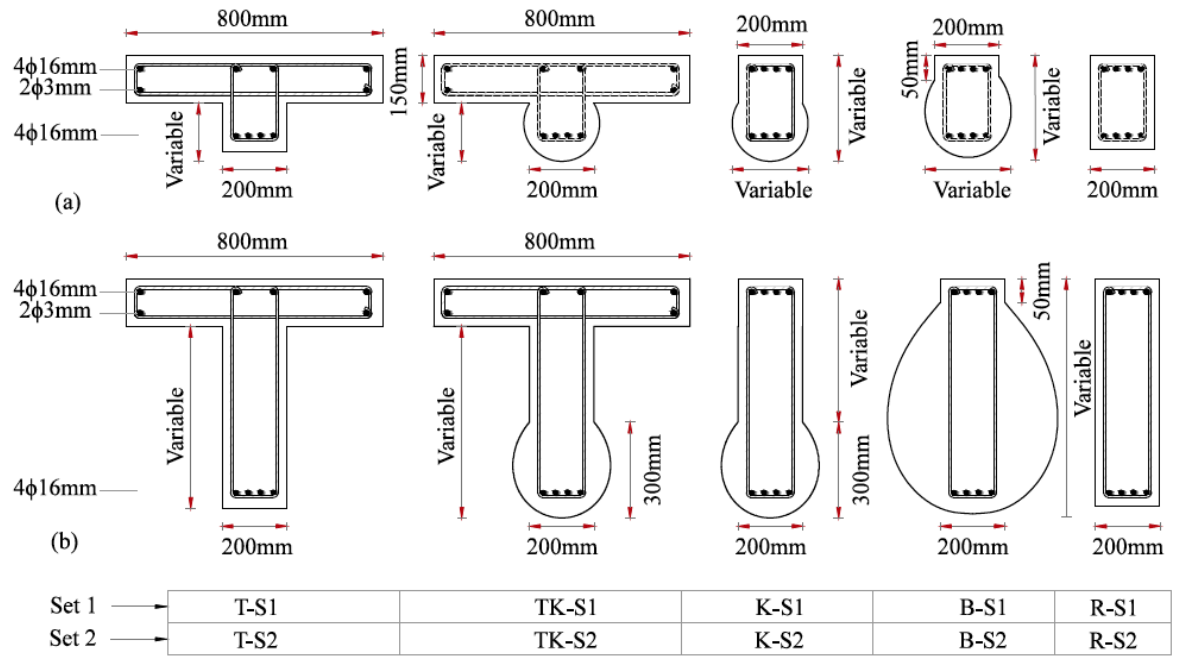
Cross-section details of beams in set one and two (a) Sections near supports, (b) Sections near mid-span
